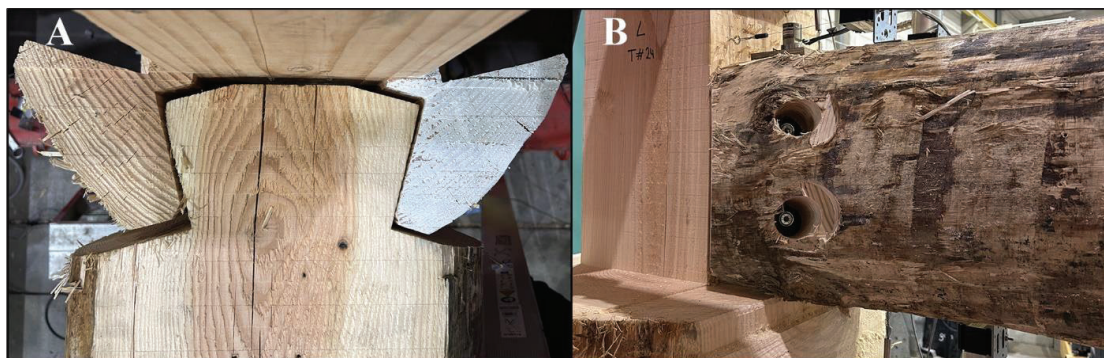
(A) Top view of dovetail joint slotted into a whole log column element. (B) Whole log beam seated at the tenon on the column support and fastened to the column centre with structural screws and material volume removed below beam for access purposes.
